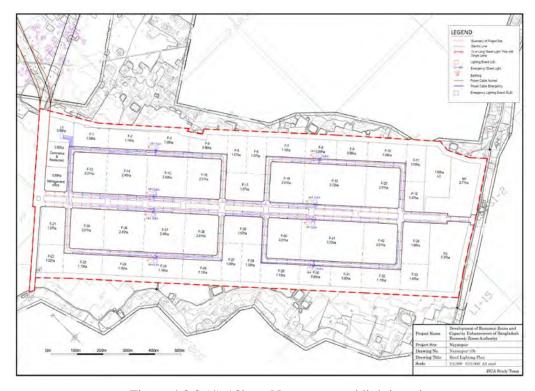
(4)-13b Nayanpur road lighting plan
